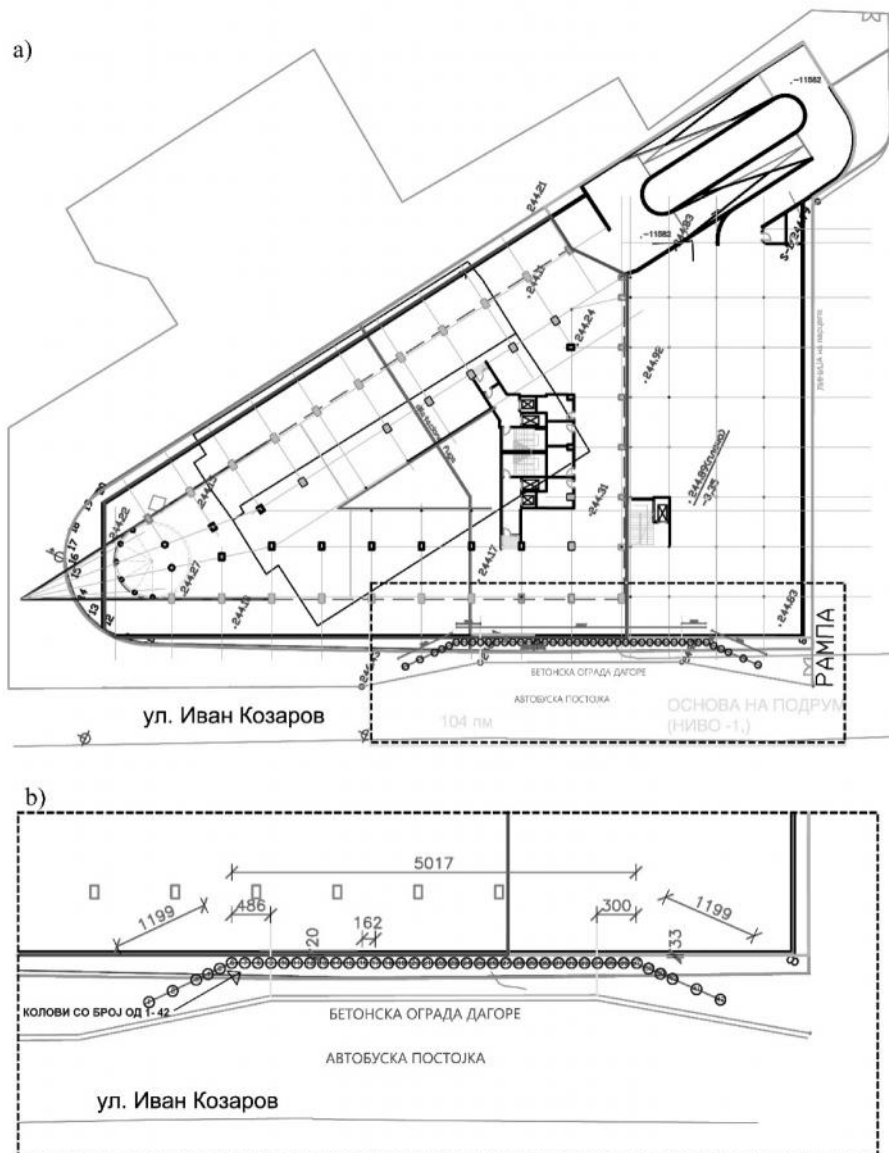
Plan; a) of basement level, level -1; b) of the RC pile support structure
